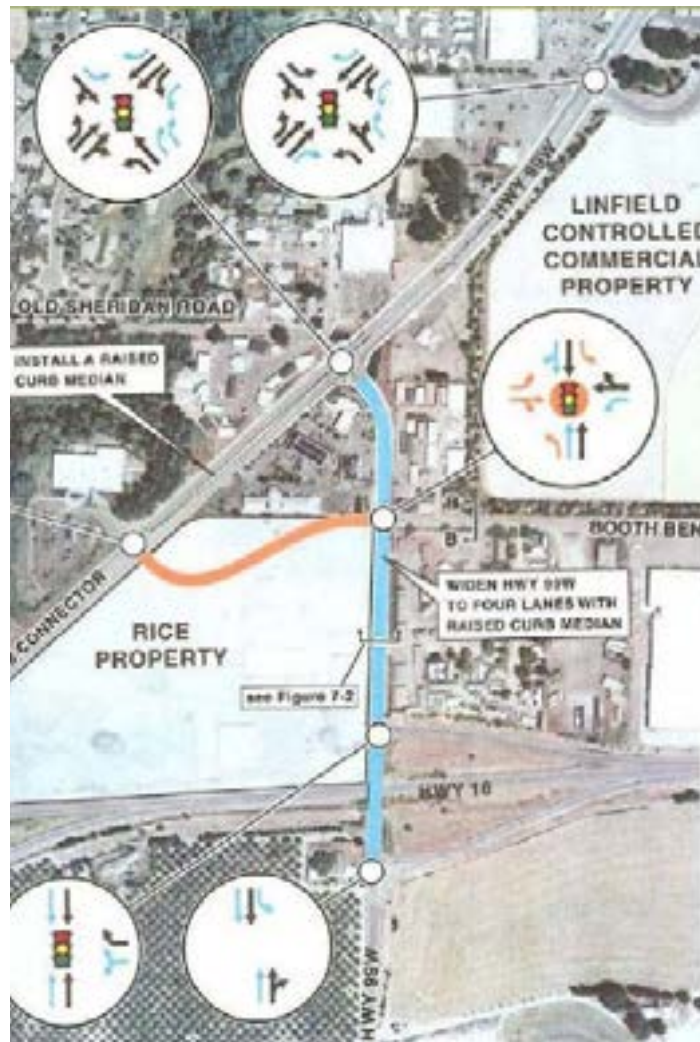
Highway 18/99W Plan. Transport Group | Chapter 4 – Street System Plan
